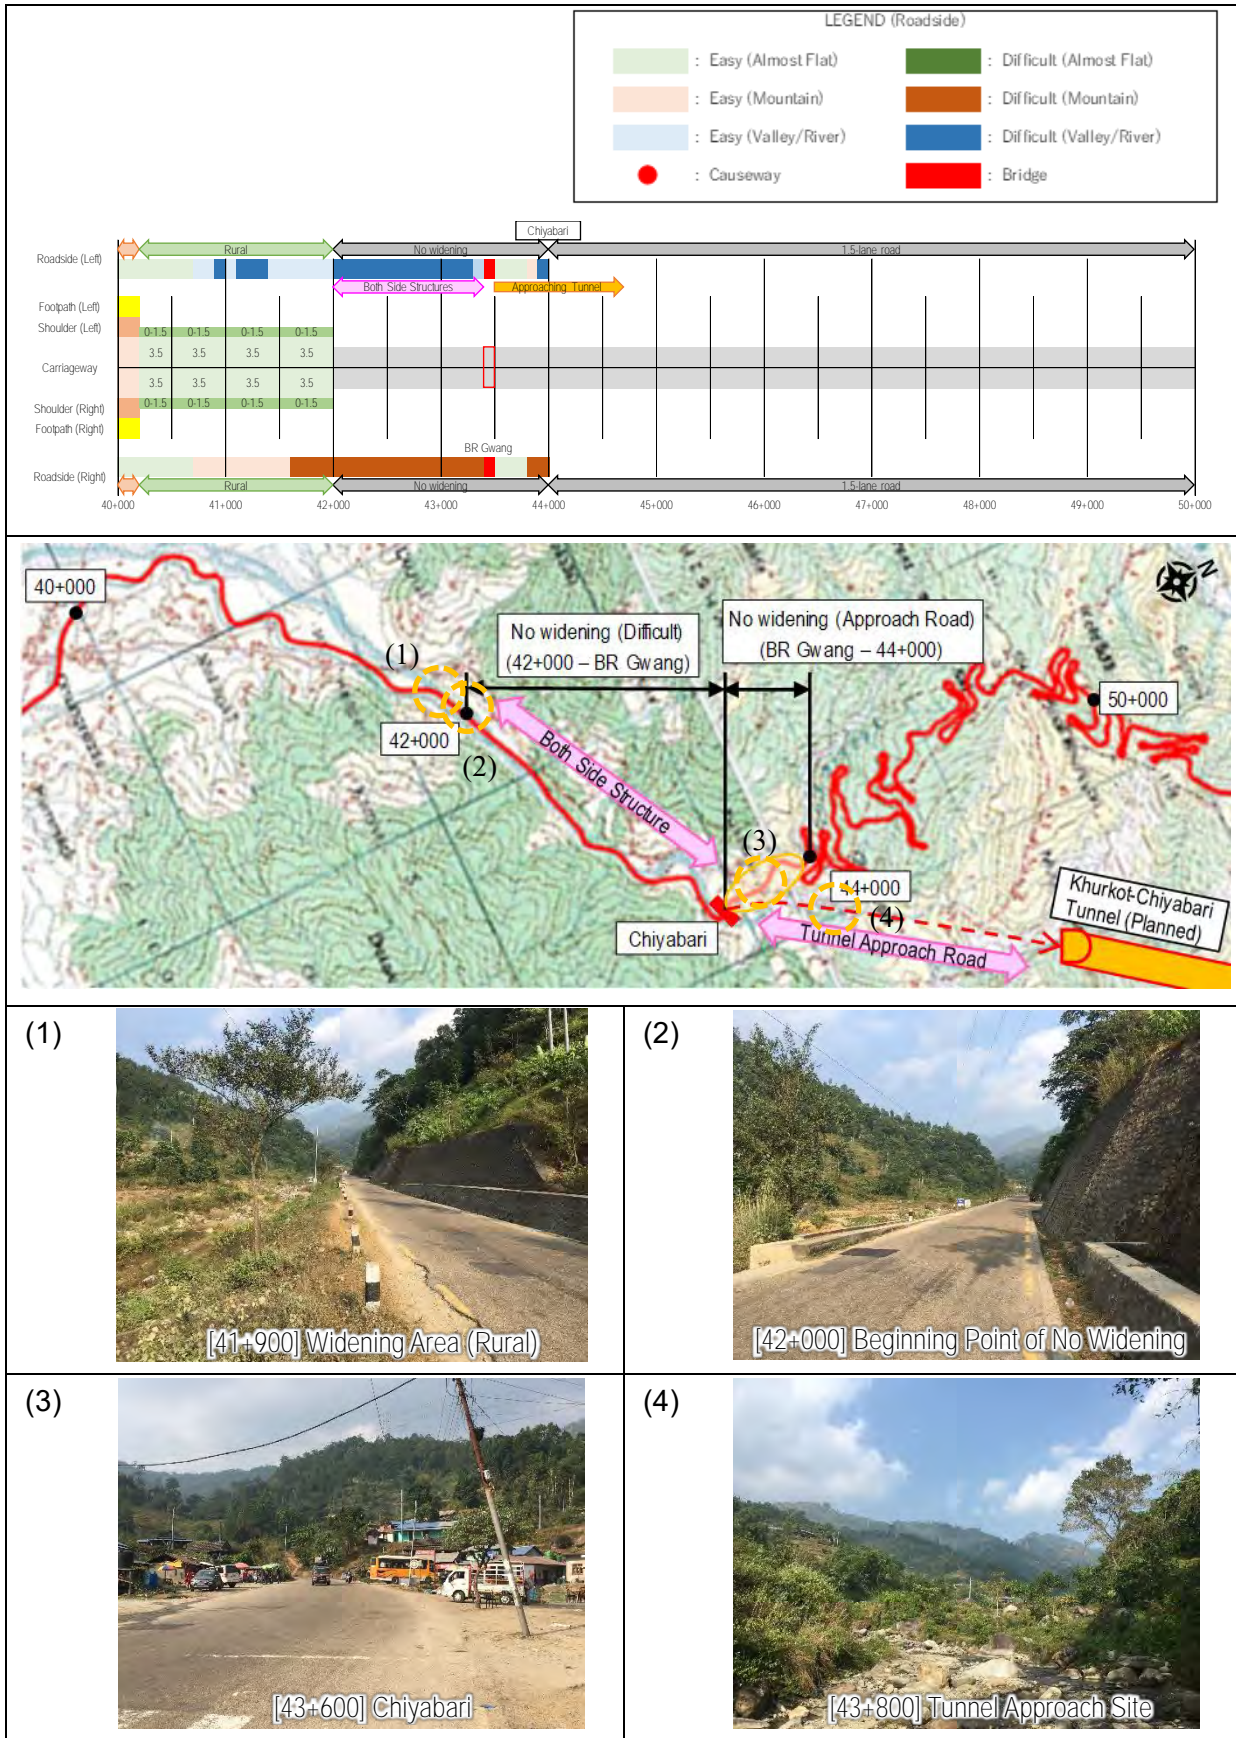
Example of Application of Cross Section Type (Ch.40-44km)
